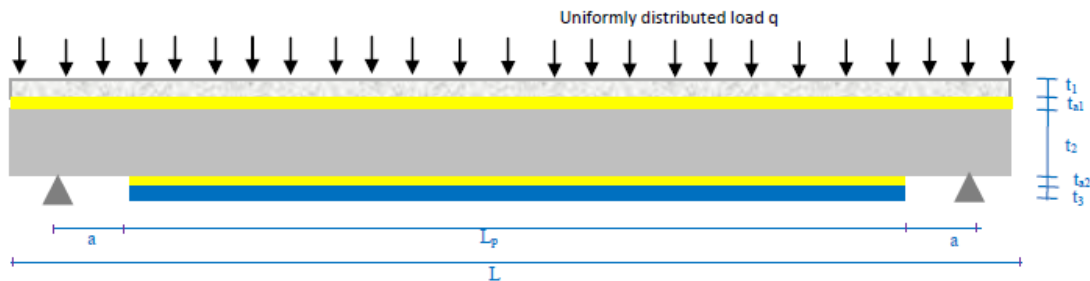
Simply supported composite box girder bridge-slab reinforced concrete beam with perpendicular core 90 bonded by a composite plate
